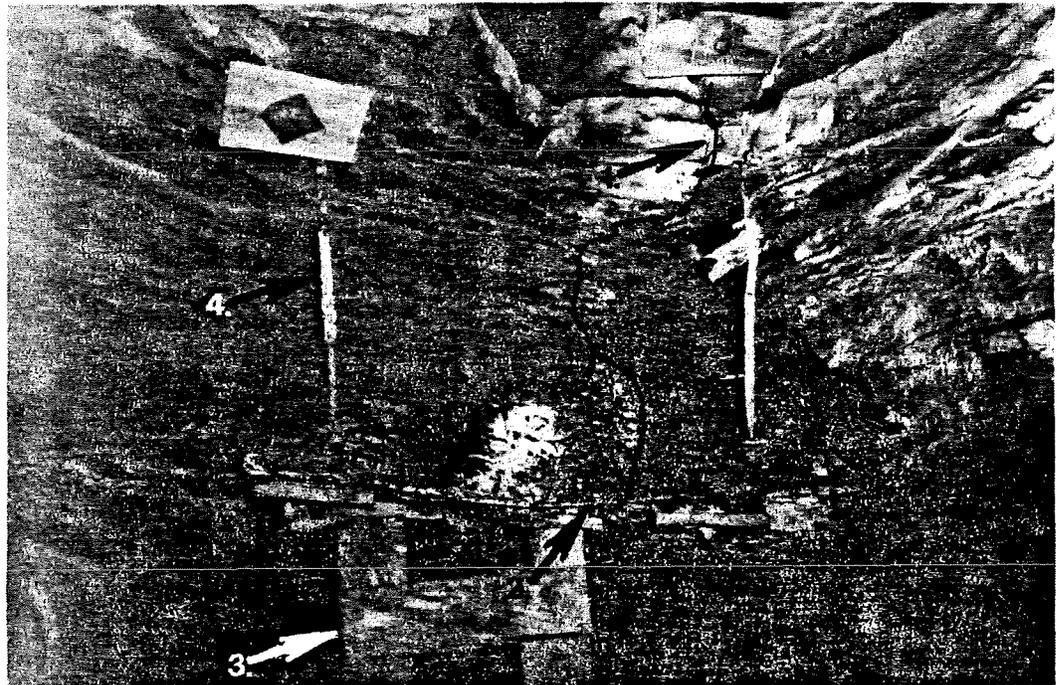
Photograph showing adverse effects of high horizontal stress, northern Wasatch Plateau Coal Field. High horizontal stress is causing siltstone roof to fracture and collapse. Arrow 1. points to highlighted fracture in roof; arrow 2. points to ineffective roof truss; arrow 3. points to crib; arrow 4. points to ineffective roof bolt that remained anchored subsequent to major roof fall.
